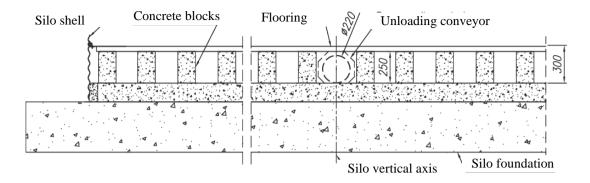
A steel floor on concrete blocks - conditions for installation of an underfloor unloading conveyor.
